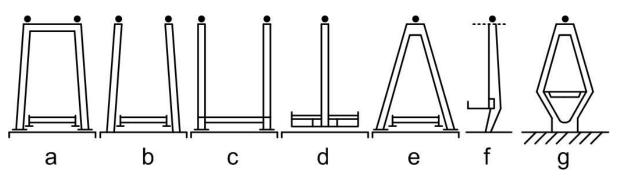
Shapes of Towers Used for Cable-Stay Bridges
